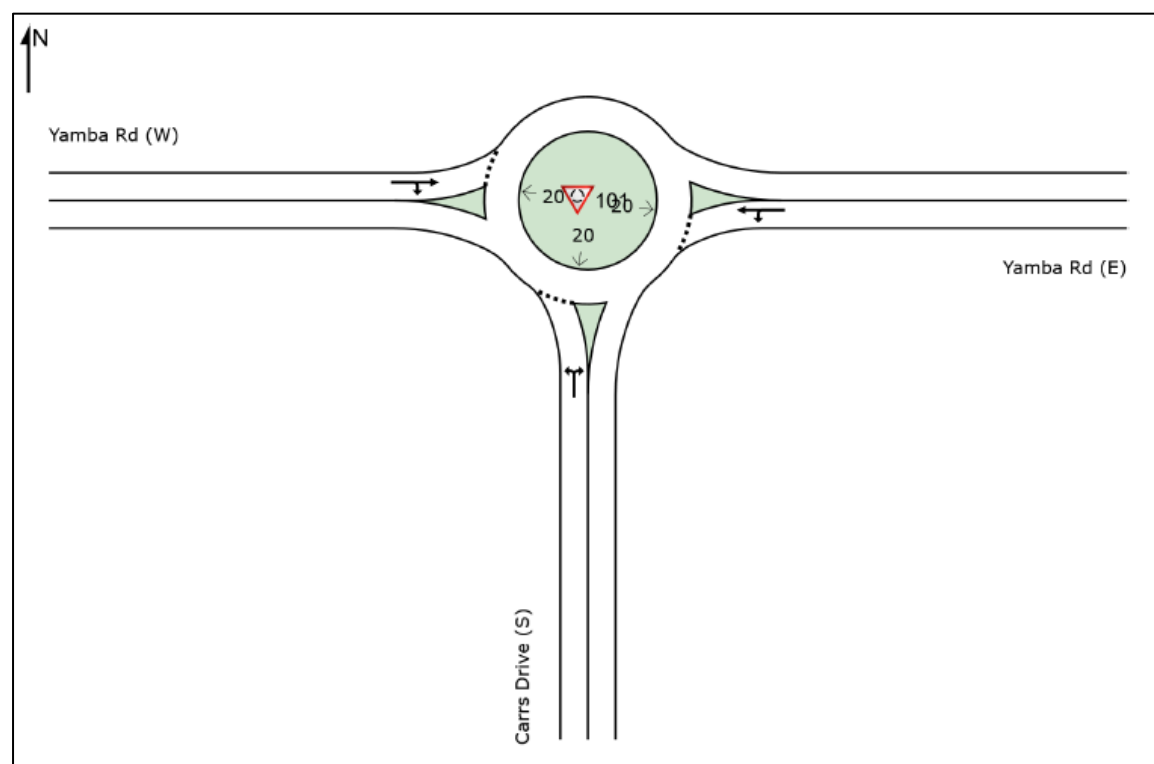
Yamba Road / Carrs Drive SIDRA Intersection Layout
